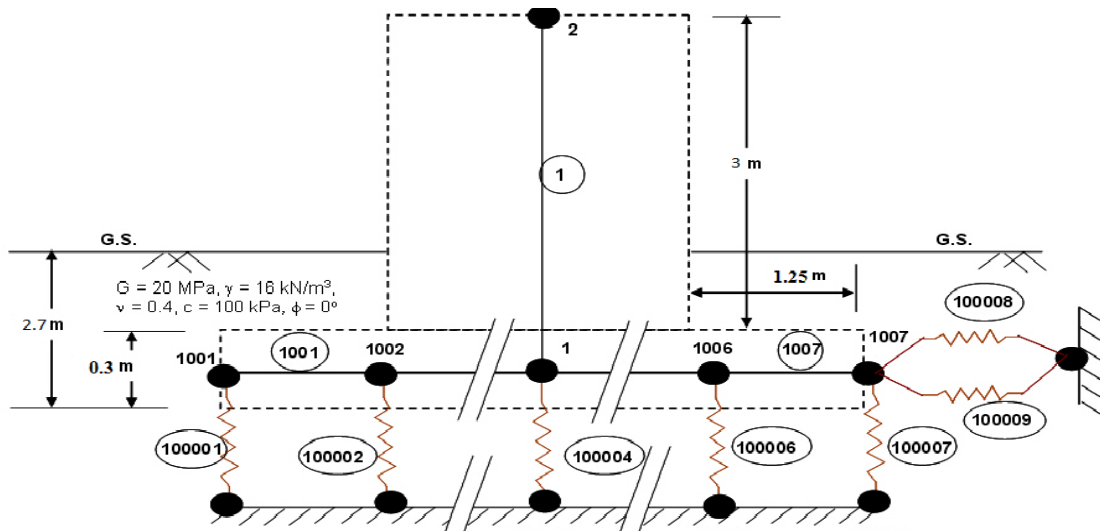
Soil data used in the modeling of soil modeling (for only Type I soil) and shallow Foundation modeling for opensees
